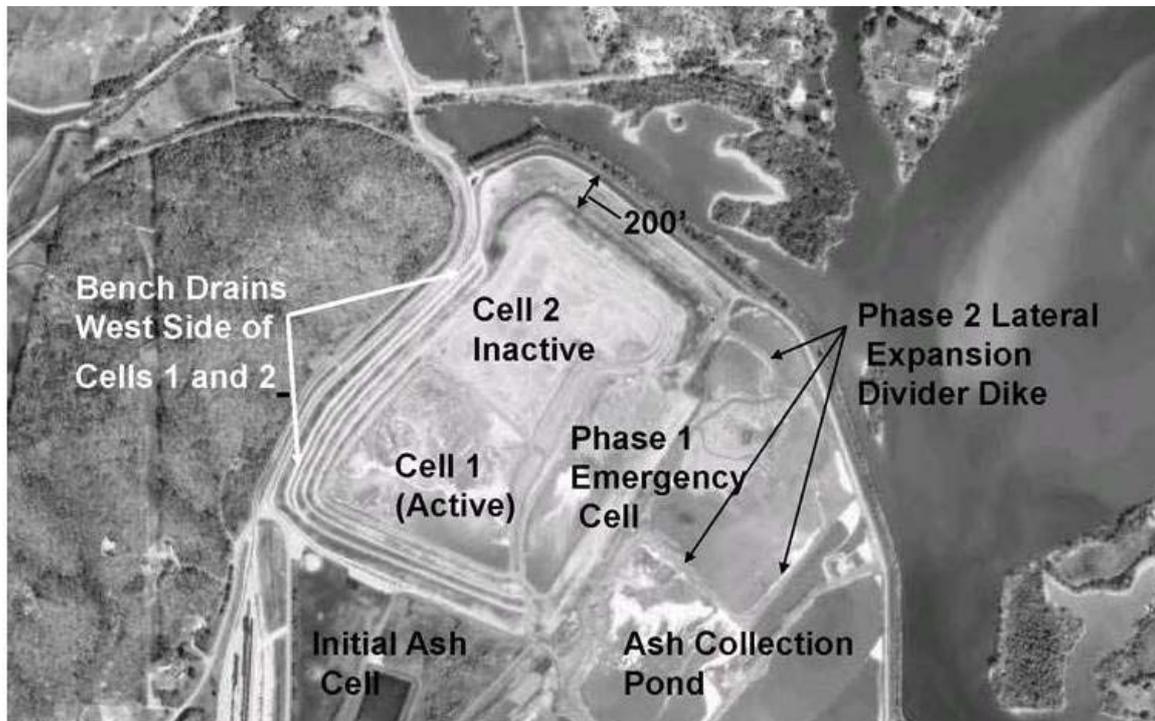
Kingston Dredge Cell Site Plan (2008).¹
